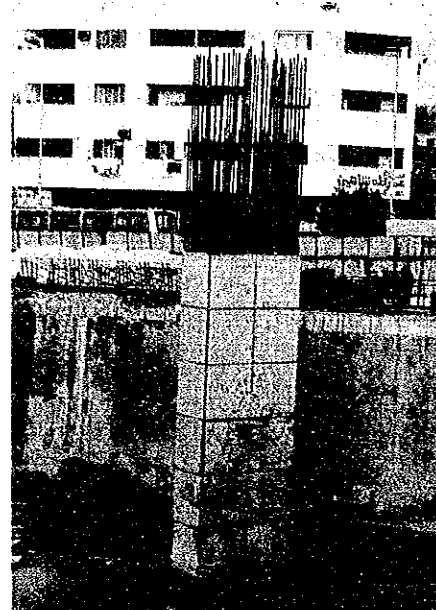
Bridge pier under construction (next to the July 26th Bridge in Cairo)
